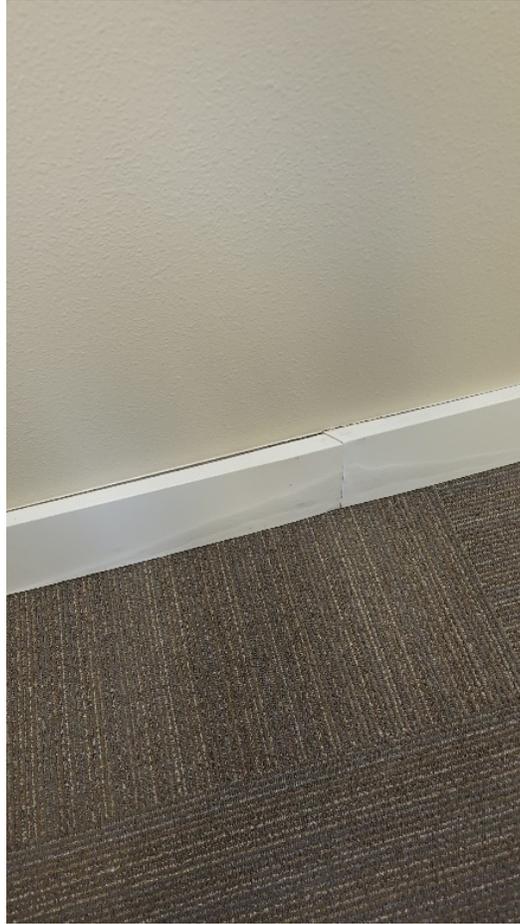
Council chamber on the second floor, west wall: swollen baseboard.
